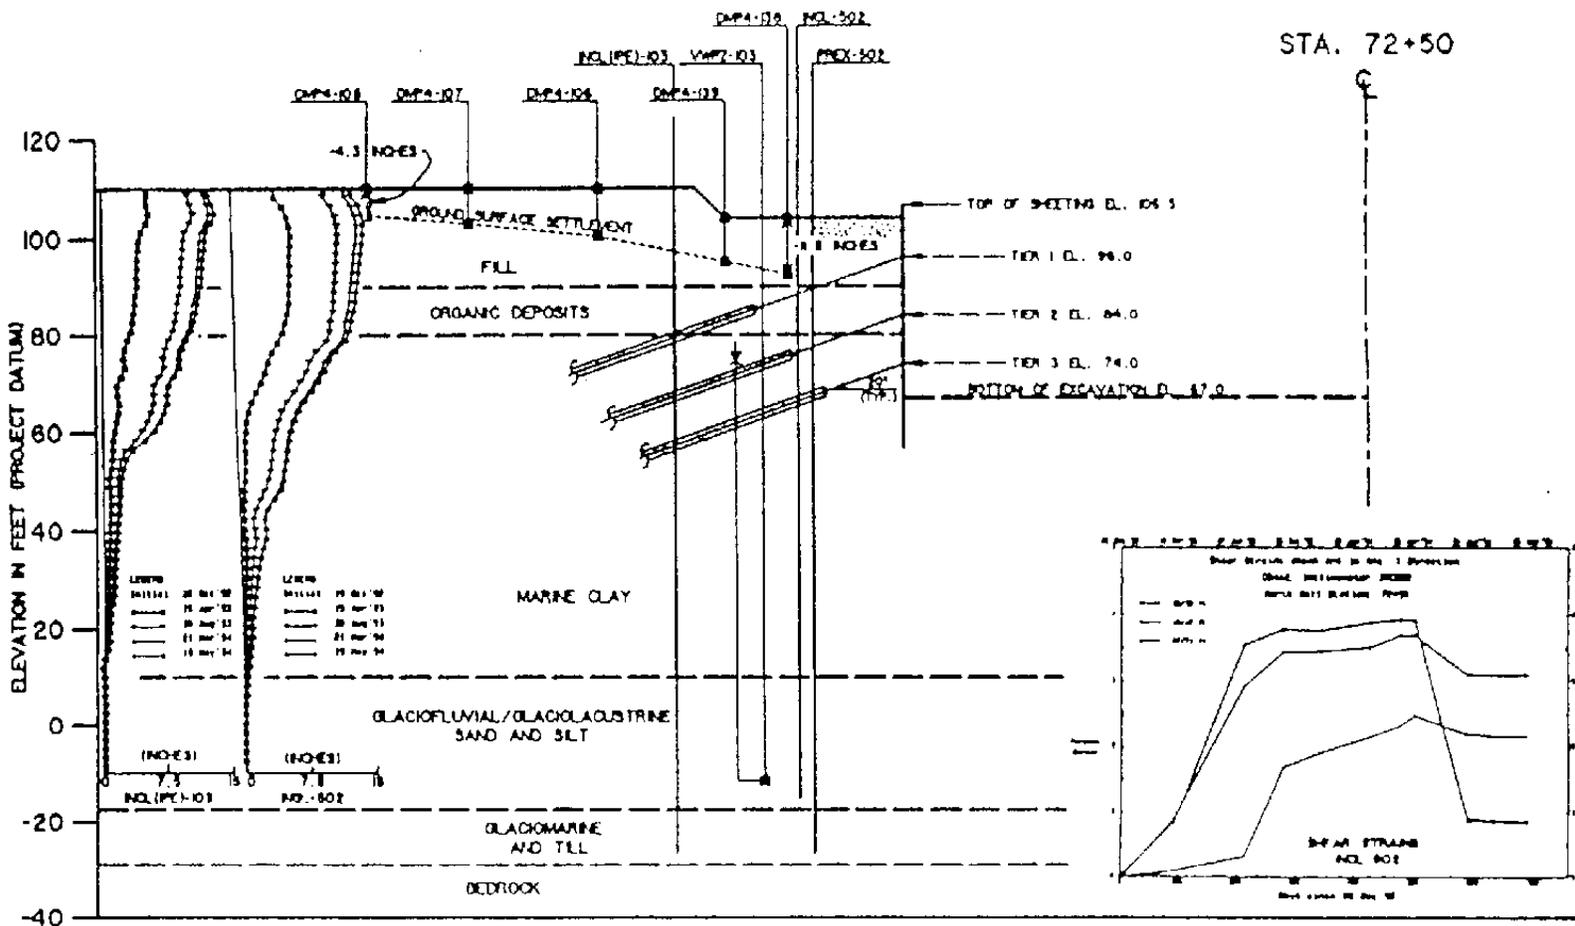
Deformations at Station 72+50, Sheet Pile Wall (Vaghar and Bobrow)
